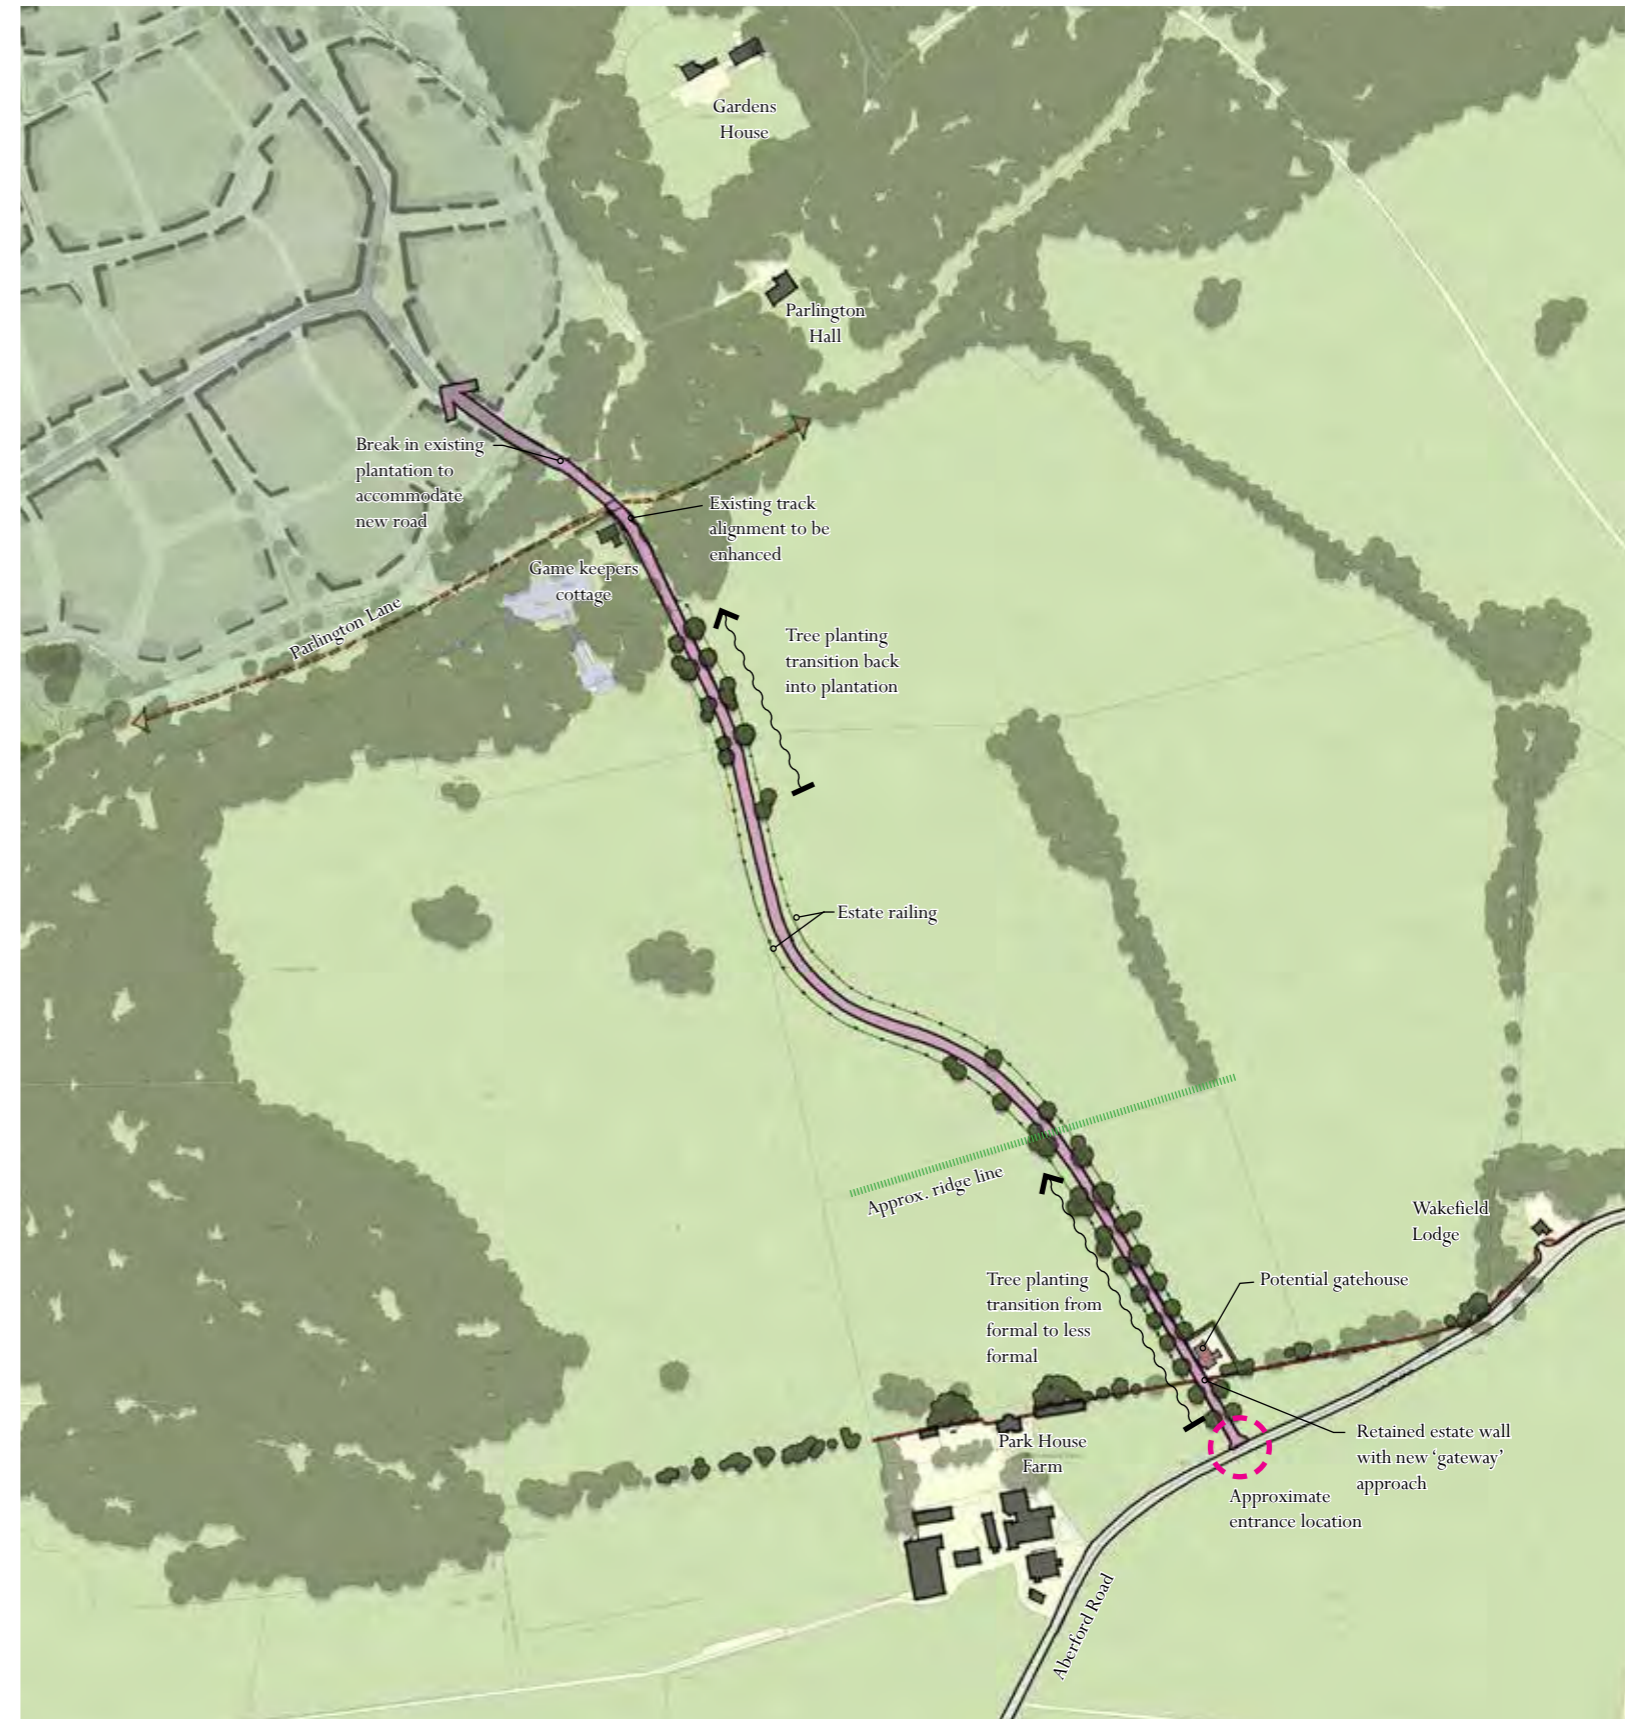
Plan showing the approach from Aberford Road
